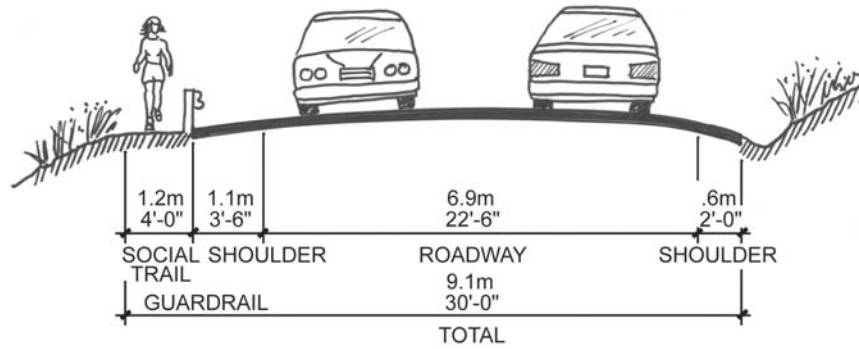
Existing Conditions at Lincoln Boulevard at Washington Boulevard
